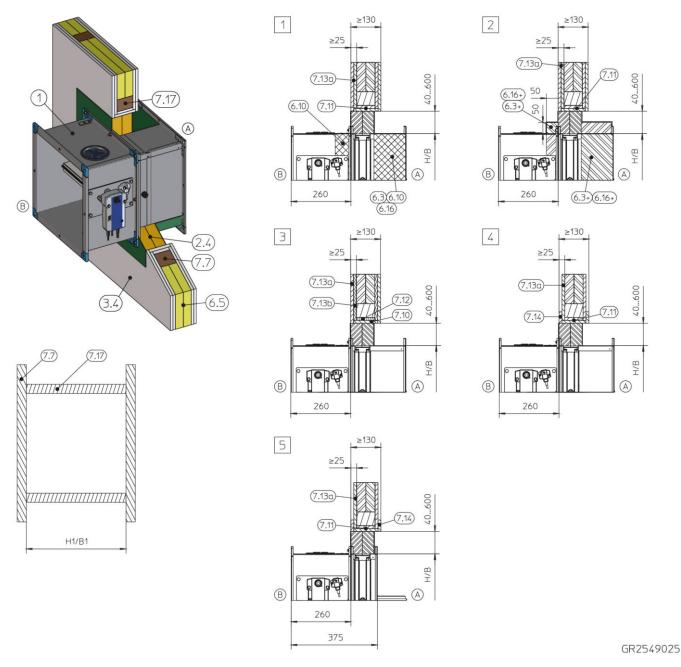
Dry mortarless installation into a lightweight partition wall with timber support structure, with a fire batt
